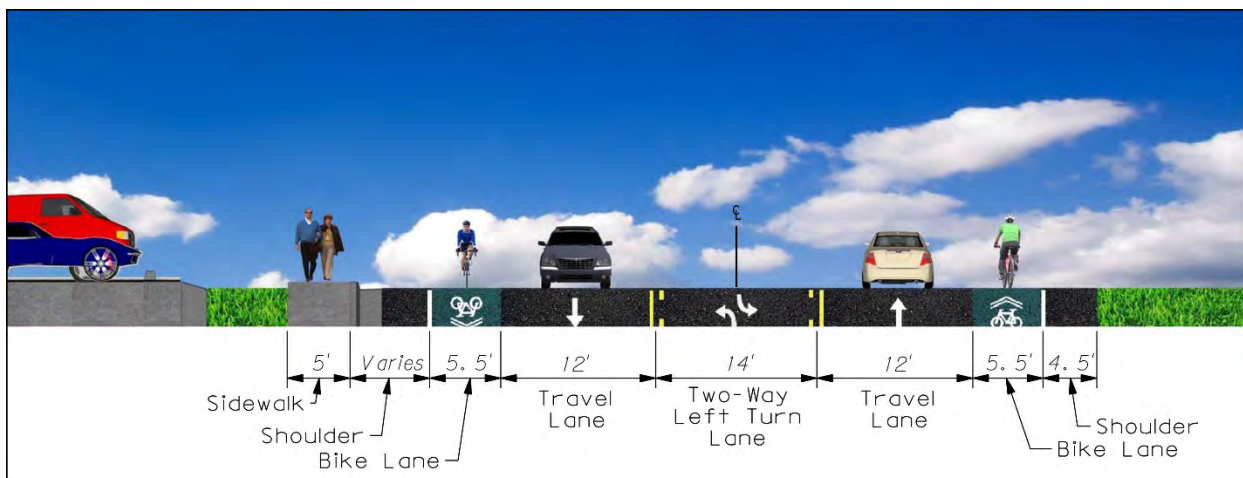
North of Cooke to I-94 Bridge - Typical Section
